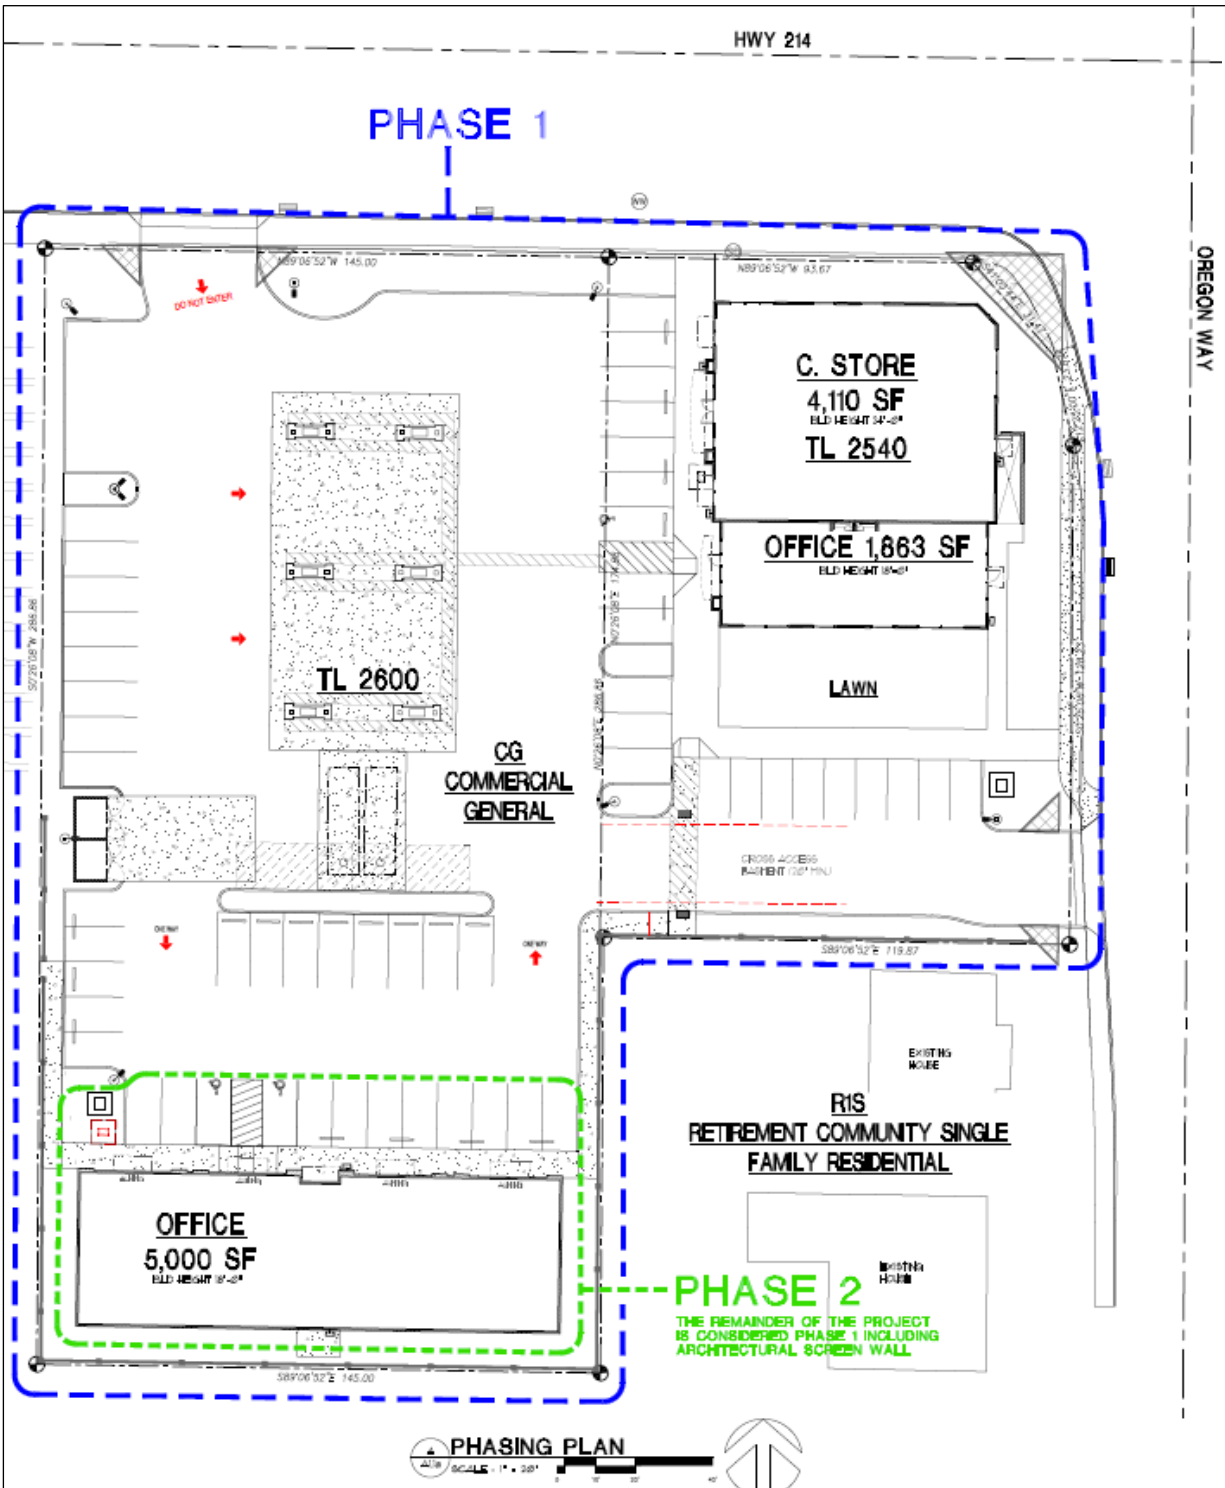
Phasing plan excerpt from Sheet A1.1a submitted February 8, 2024
